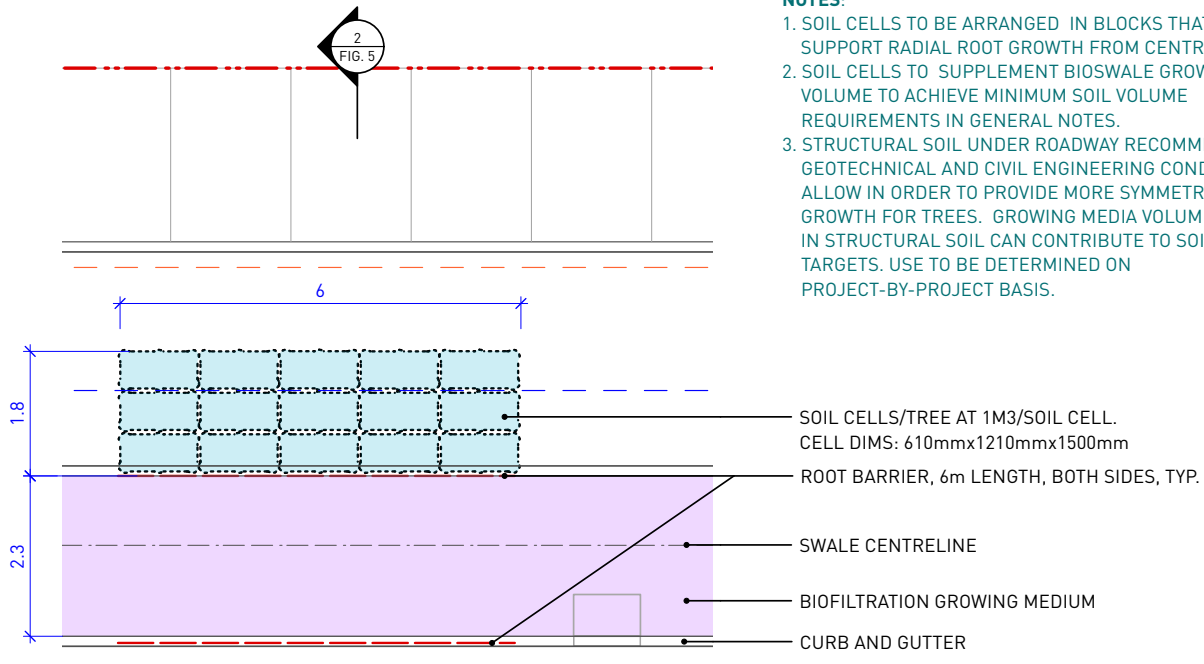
SECTION 1 - TYPICAL STREETSCAPE
